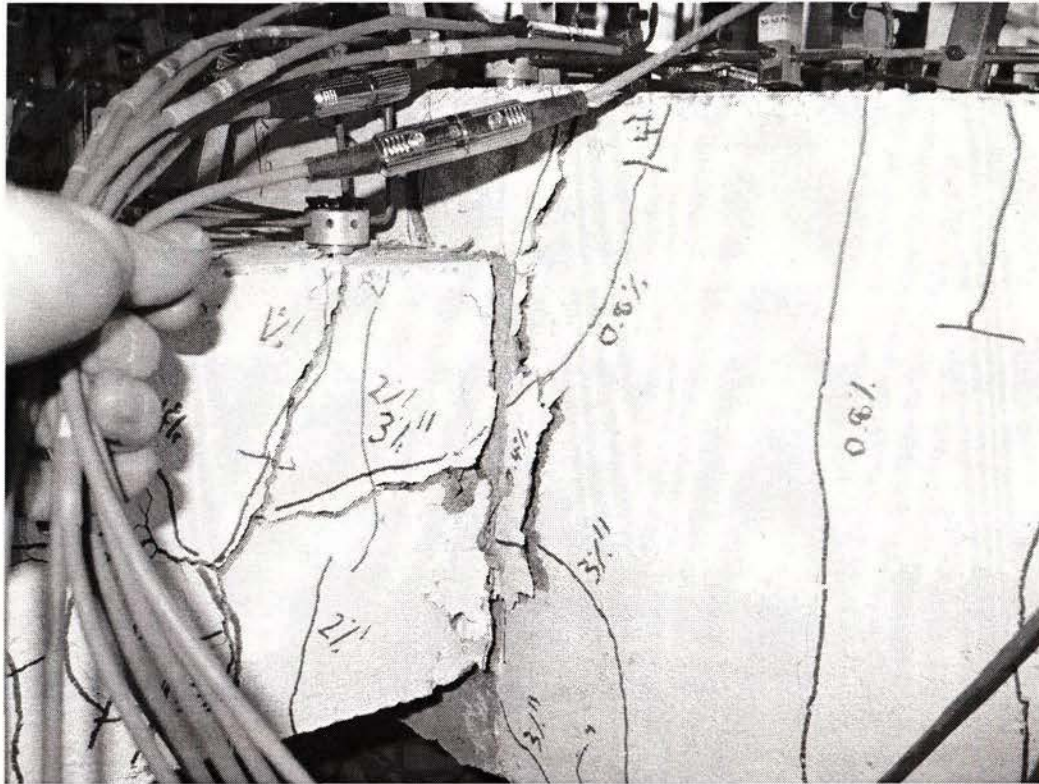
Concrete being pulled from the joint zone by slipping beam reinforcement, fourth half-cycle to 4% drift
